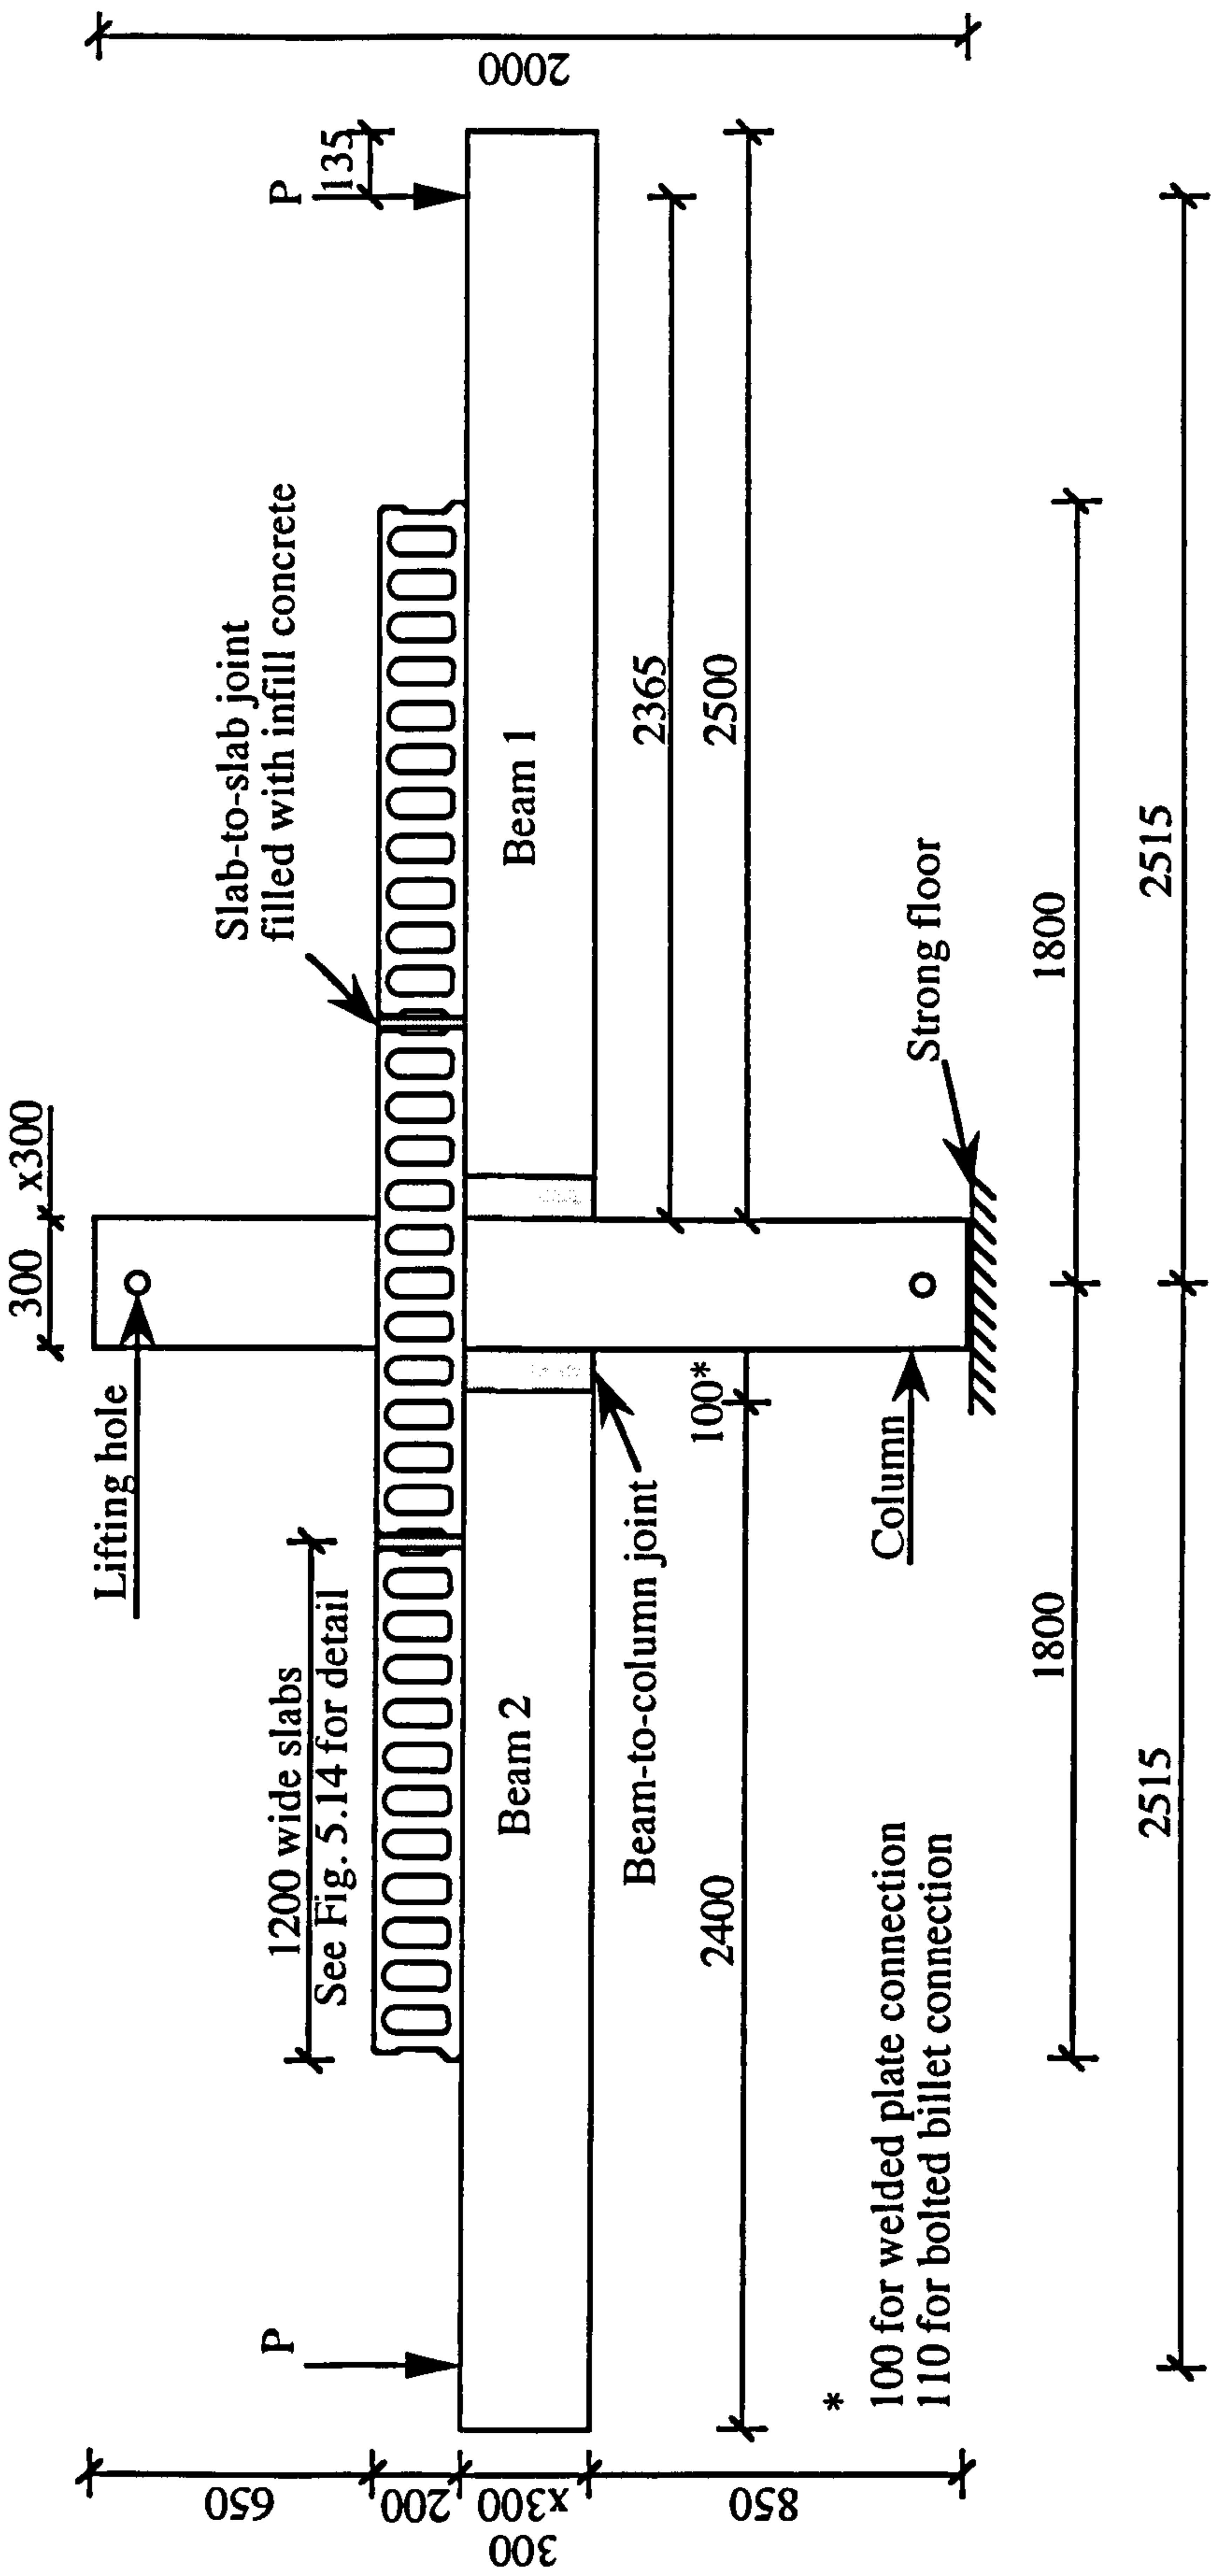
(a): Front elevation of subframe SF1 with floor slabs for test series 1-TW1(A) and test series 3-TB1(A)
